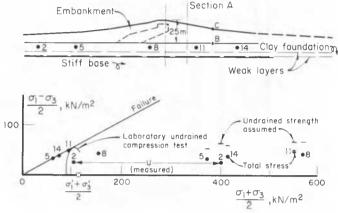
Cross-section of Empinham Dam and undrained shear strength of clay foundation
